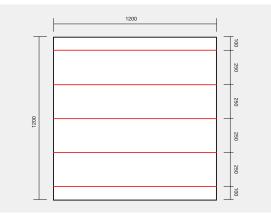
Pattern of adhesive on wood / concrete / SW panels
